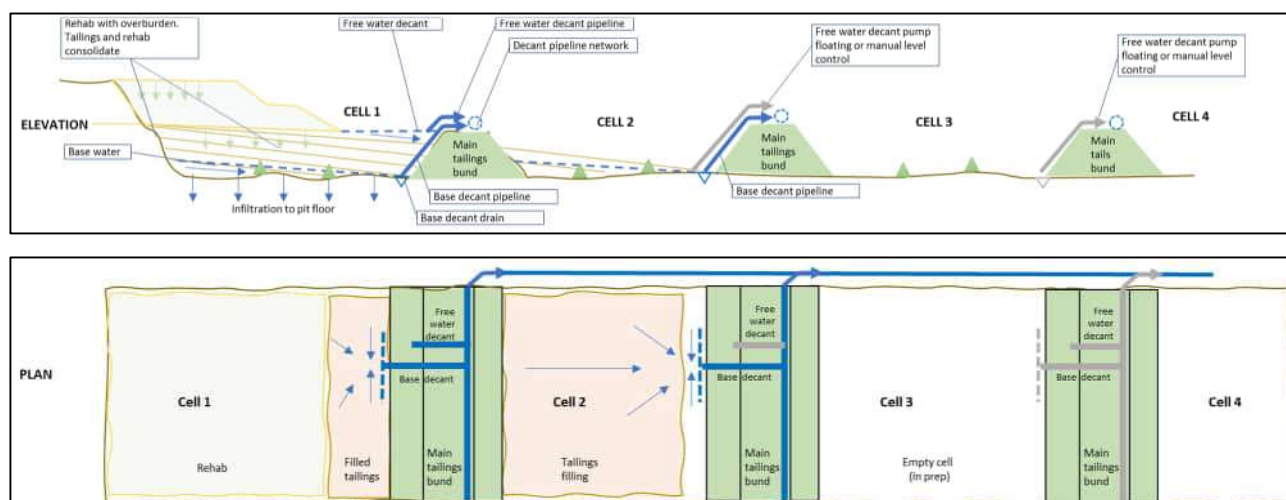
Plan and Cross-section view of staged backfill over 4 consecutive pit cells
